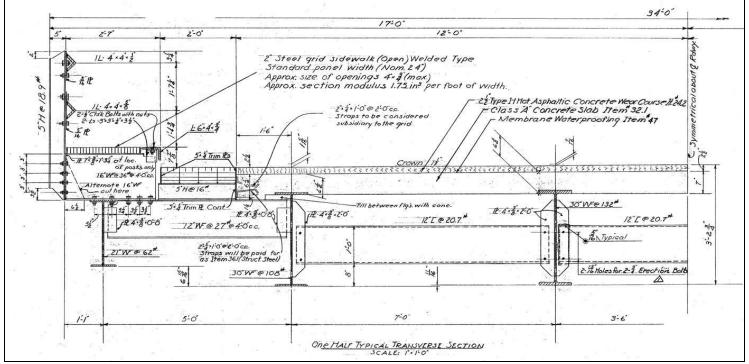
Half transverse section of deck and superstructure from original drawings (NHDOT File No. 3-4-3-5).
